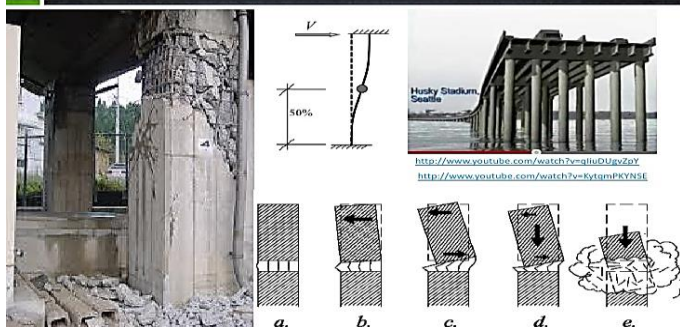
Substructure damage in a reinforced concrete bridge pier due to inadequate confinement and shear capacity under seismic loading, emphasizing the need for column strengthening strategies (Moehle & Eberhard, 2000)
